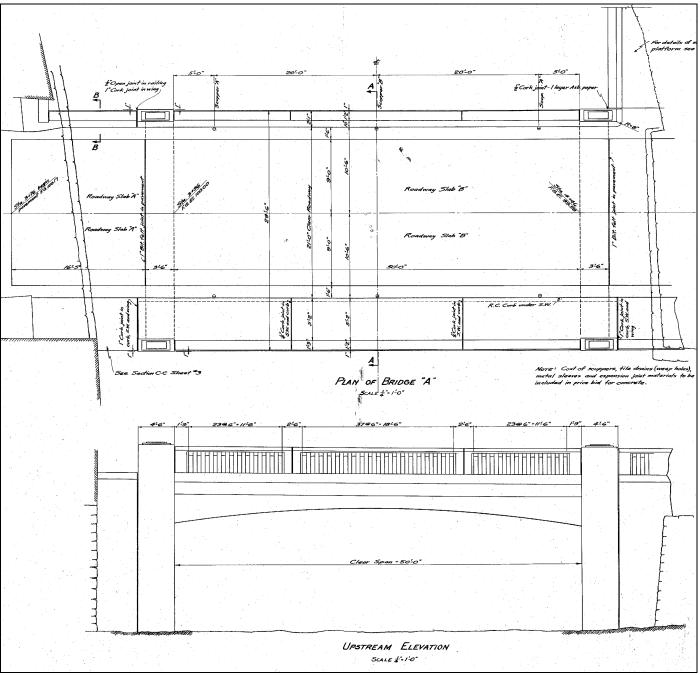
Original bridge plan, Sheet 2 of 7, 1935, showing plan and elevation of west span, "Bridge A" (103/074-W). Note new bridge abutments built inside existing stone abutments apparently left in place. (NHDOT Bridge Plan File No. T-16).
